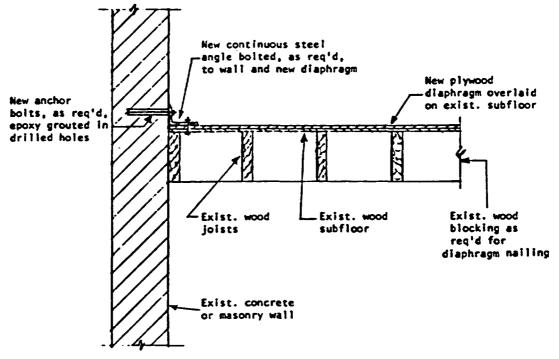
Strengthening of existing wood diaphragms in reinforced masonry buildings
